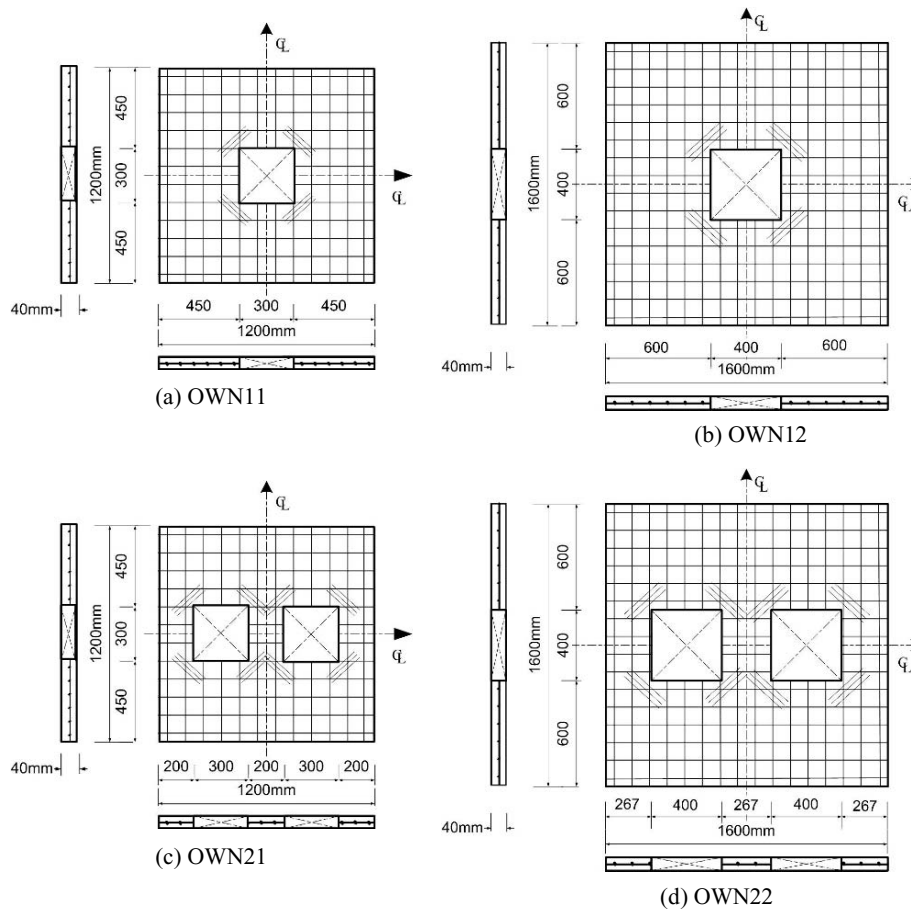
Dimension and arrangement of steel mesh in wall specimens.
